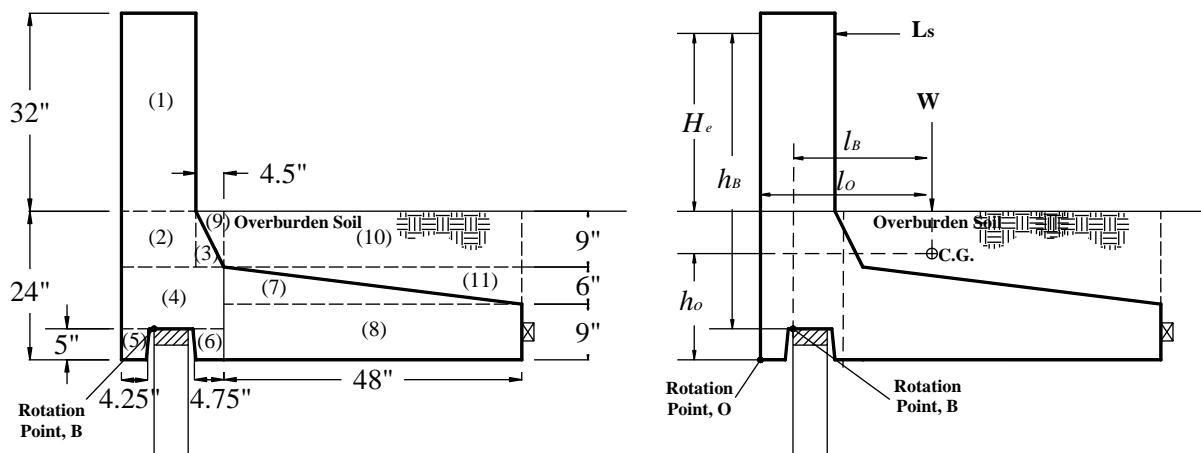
Section of a barrier-moment slab system for calculation of sliding
